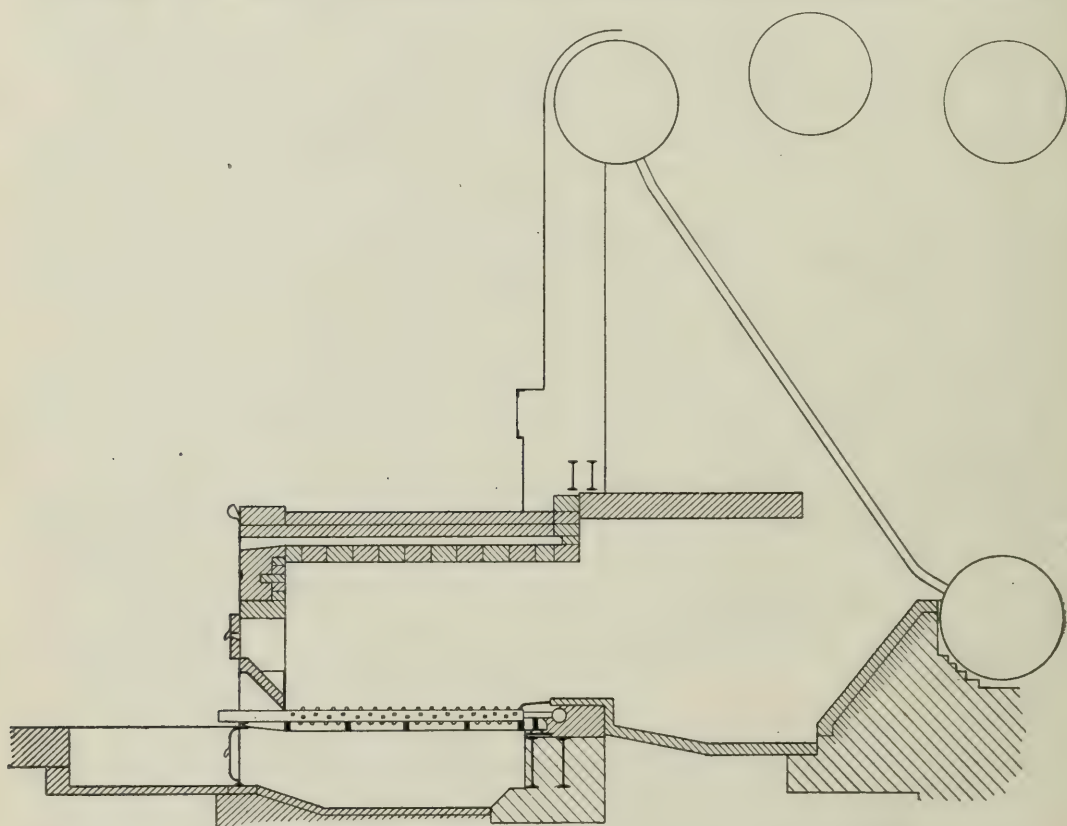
MURPHY STOKER IN SERIES WITH ARCH OF STIRLING BOILER. OUTLINE DIAGRAM SHOWING NEW INSTALLATION FOR MARSHALL FIELD & COMPANY'S RETAIL STORE.
